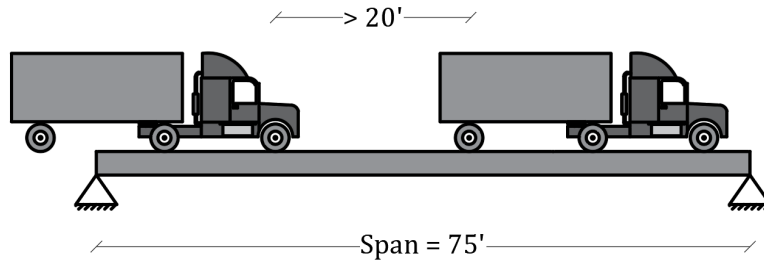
A two-truck platoon configuration for a 75-ft. simple span bridge at a headway spacing longer than 20 ft.
